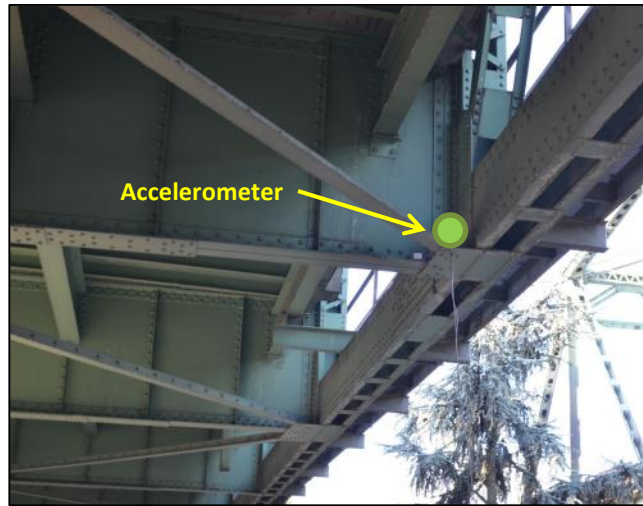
Typical accelerometer setup on a floor girder at the northbound I-5 Columbia River Bridge (Lindenberg, 2011).
